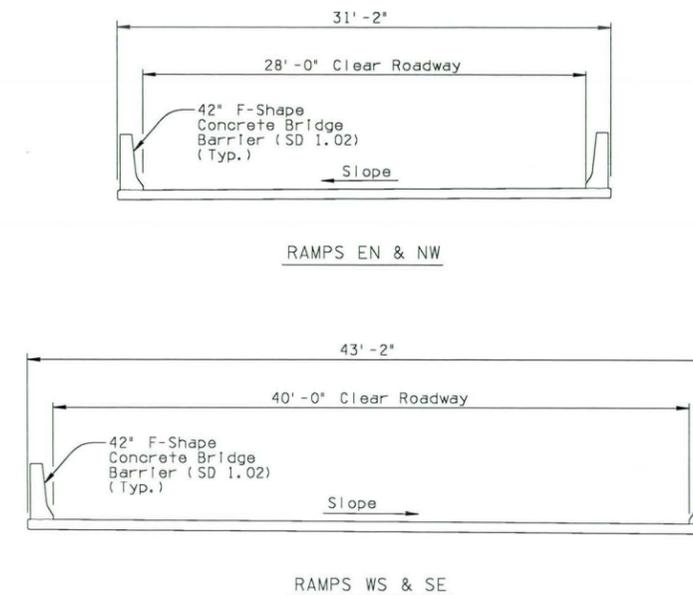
I-10/SR 303L Directional Ramps Typical Sections
